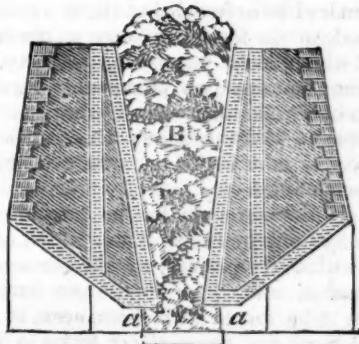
is a ground plan, fig. 2 a section B. Body of the kiln.
